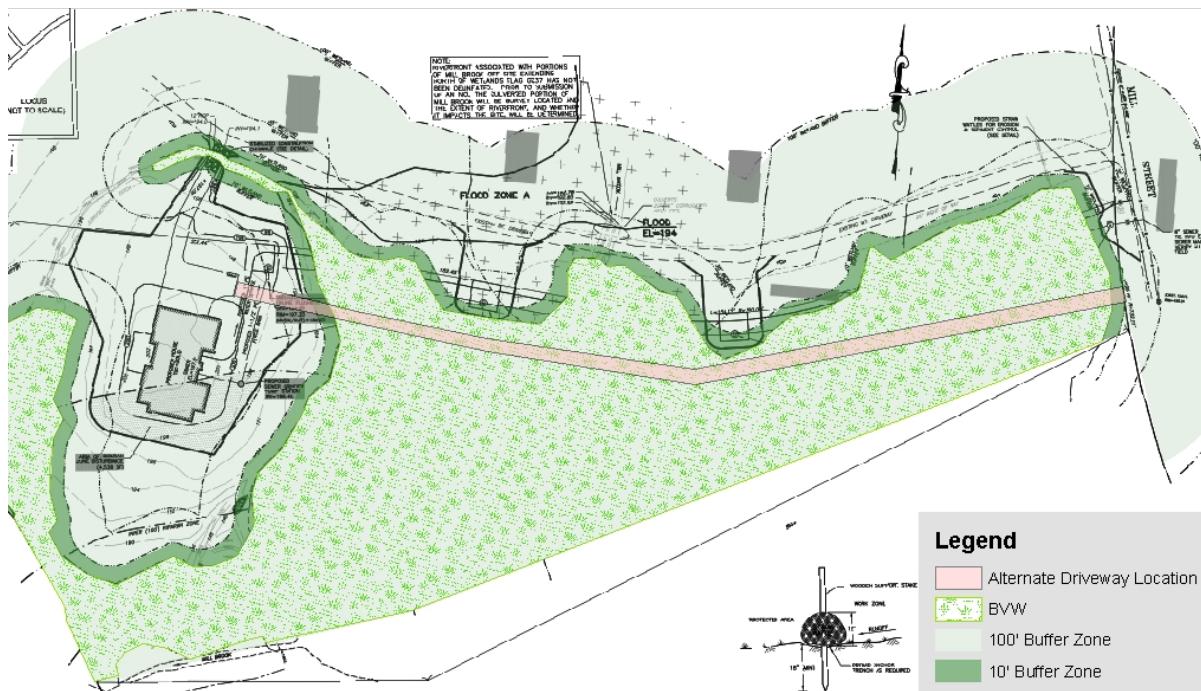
Impacts to Buffer one of BVW associated with the alternative construction of a new driveway.
